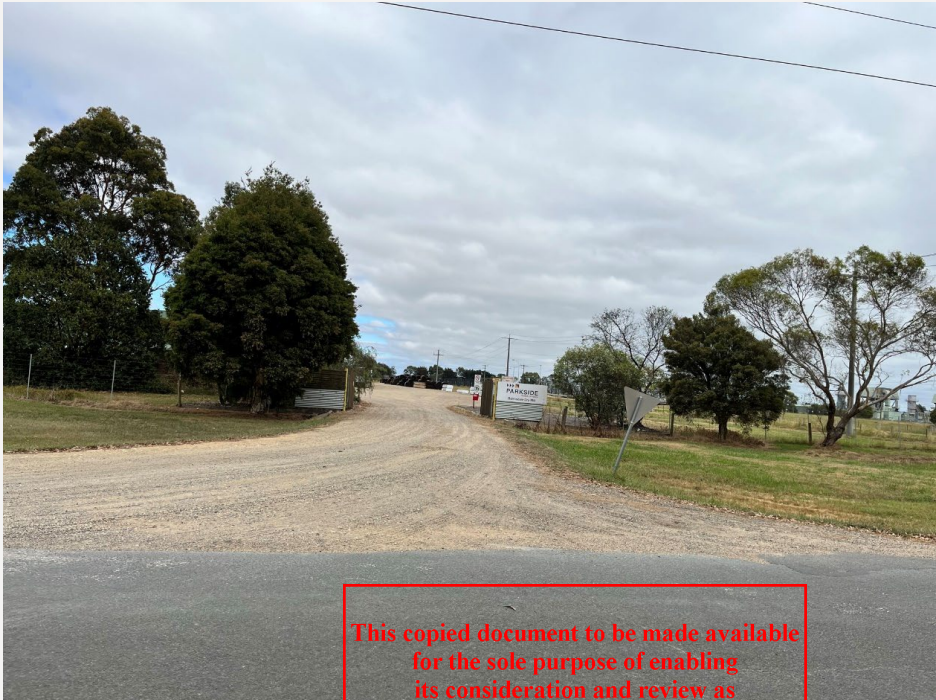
| View of northern entry to 15 Power Station Road, viewed from Power Station Road, looking west
